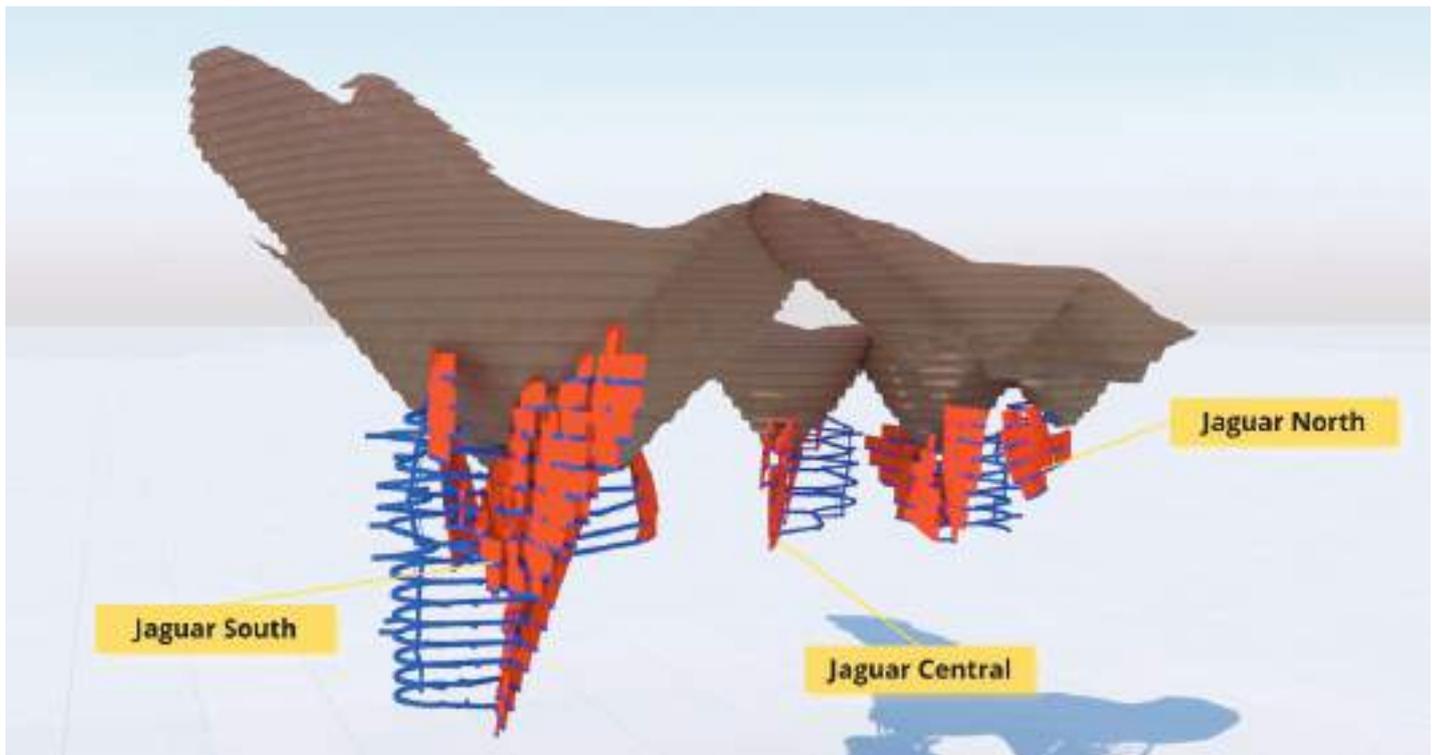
Section View Jaguar South, Central and North Underground Deposits (Looking West)
